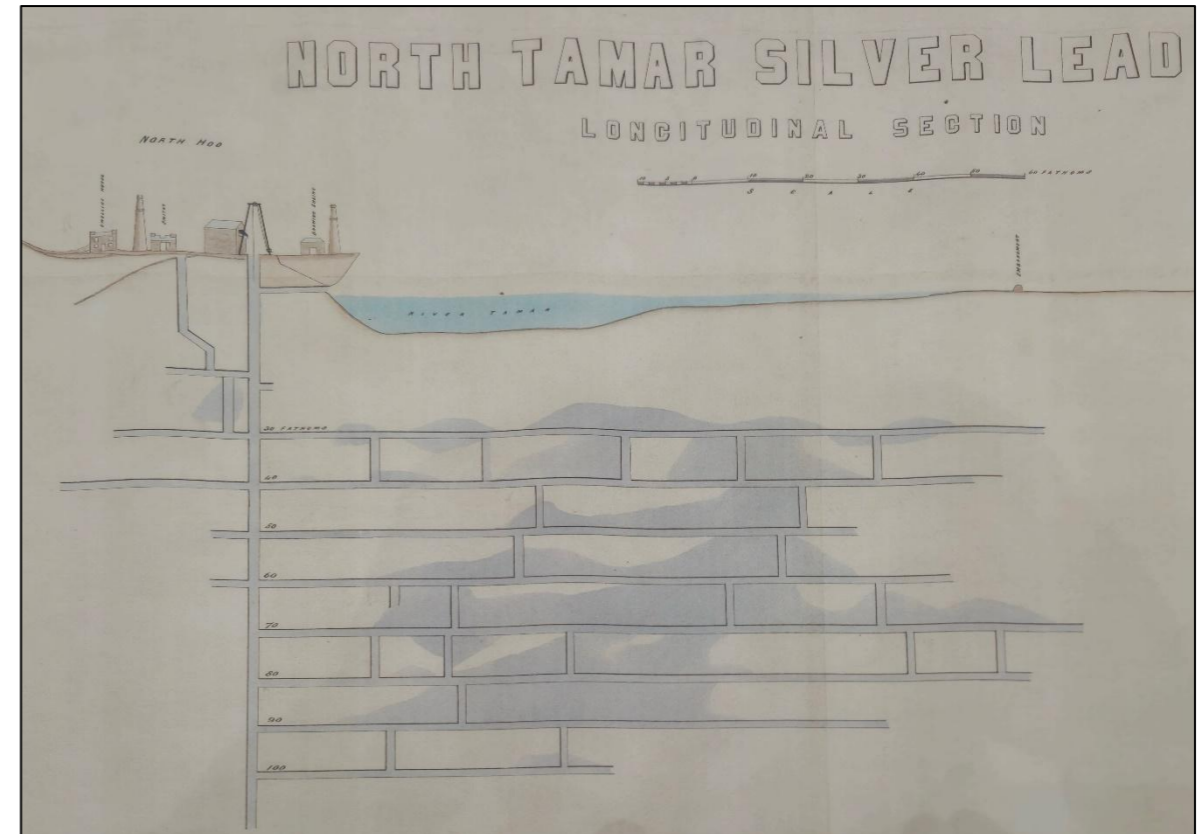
LONGITUDINAL SECTION FROM THE MINE ABANDONMENT PLANS (DHC: R264).
